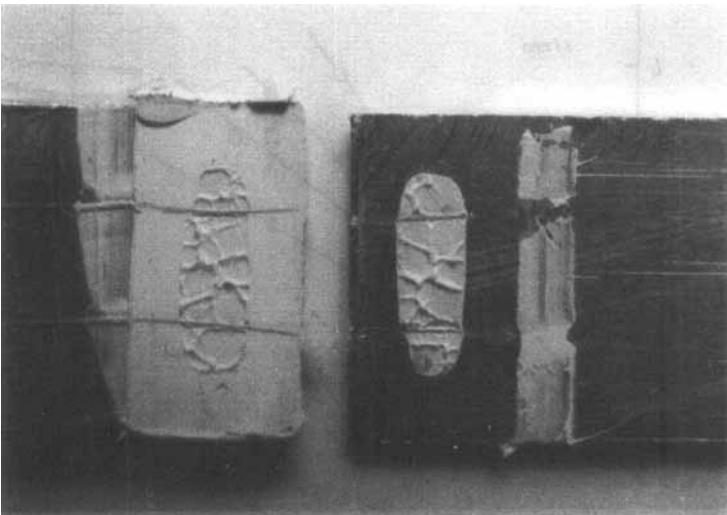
Failure surfaces of joints with silicone sealant after curing at 53.0% r.h. for 71.3 h.
